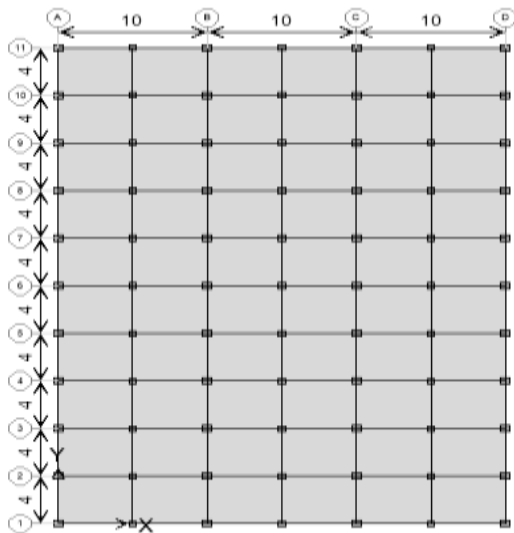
g: Plan of Type 6 model (with floating columns)
